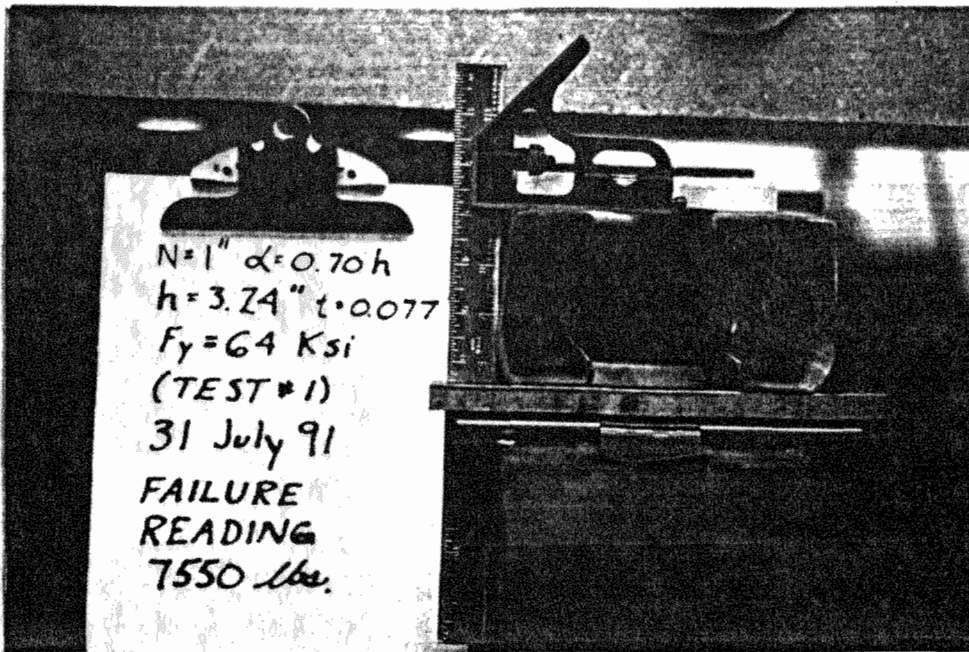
Typical Web Crippling Failure, Specimen EOF-SU-10-4(#1)
